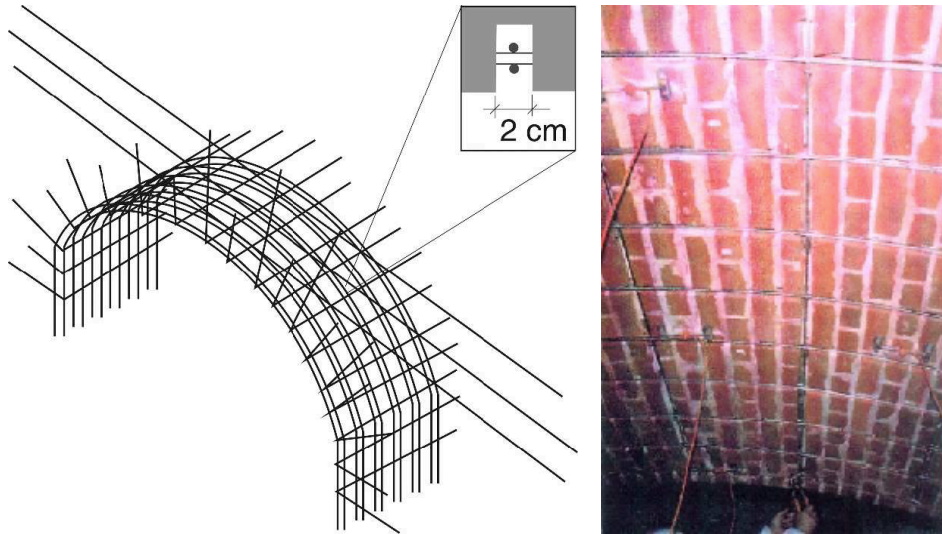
Surface reinforcement concept according to [Woodward, 1997] (left) and example of application of the reinforcement (right).
